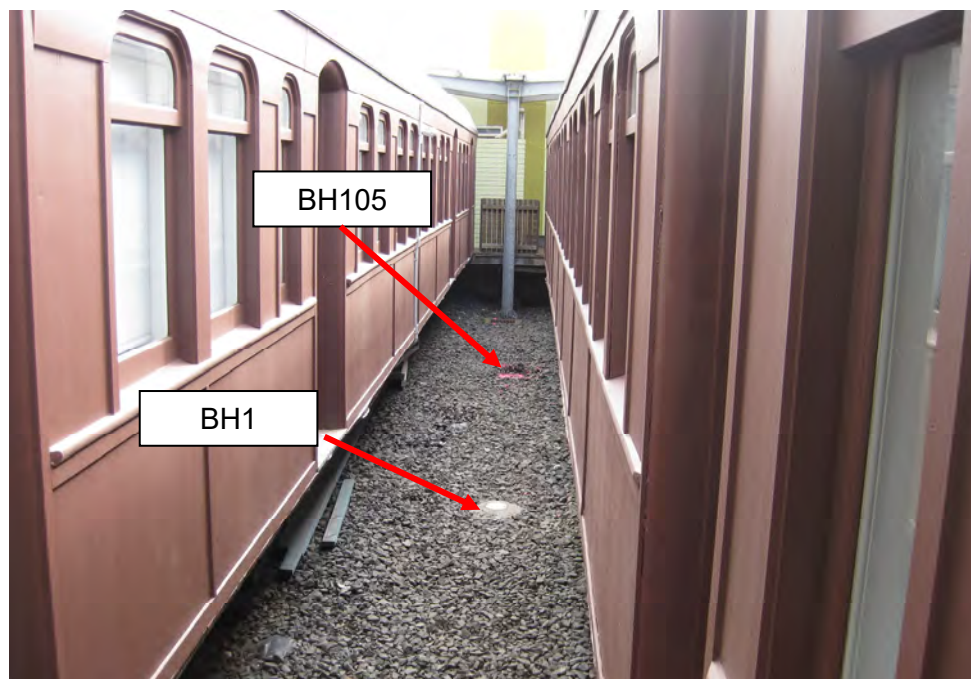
View south-west between the rail dormitory carriages on the eastern side of the YHA building (Upper Ground Floor level), with the position of boreholes BH105 and BH1 (with installed standpipe) indicated as shown.
